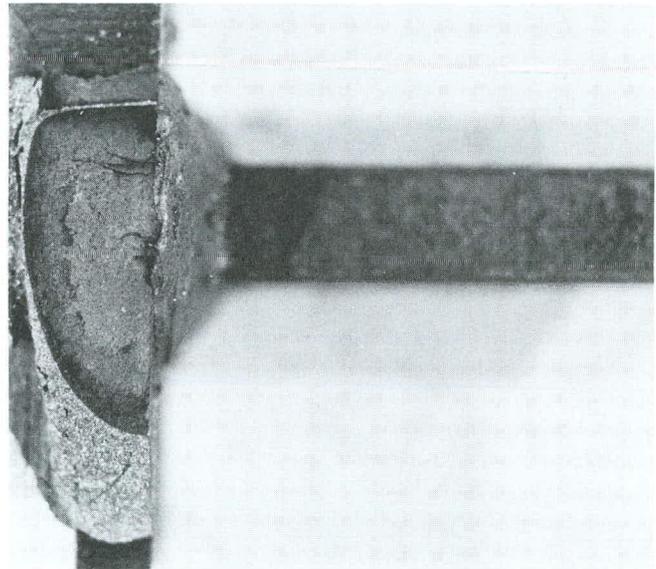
Fatigue crack in girder web from web gusset.
